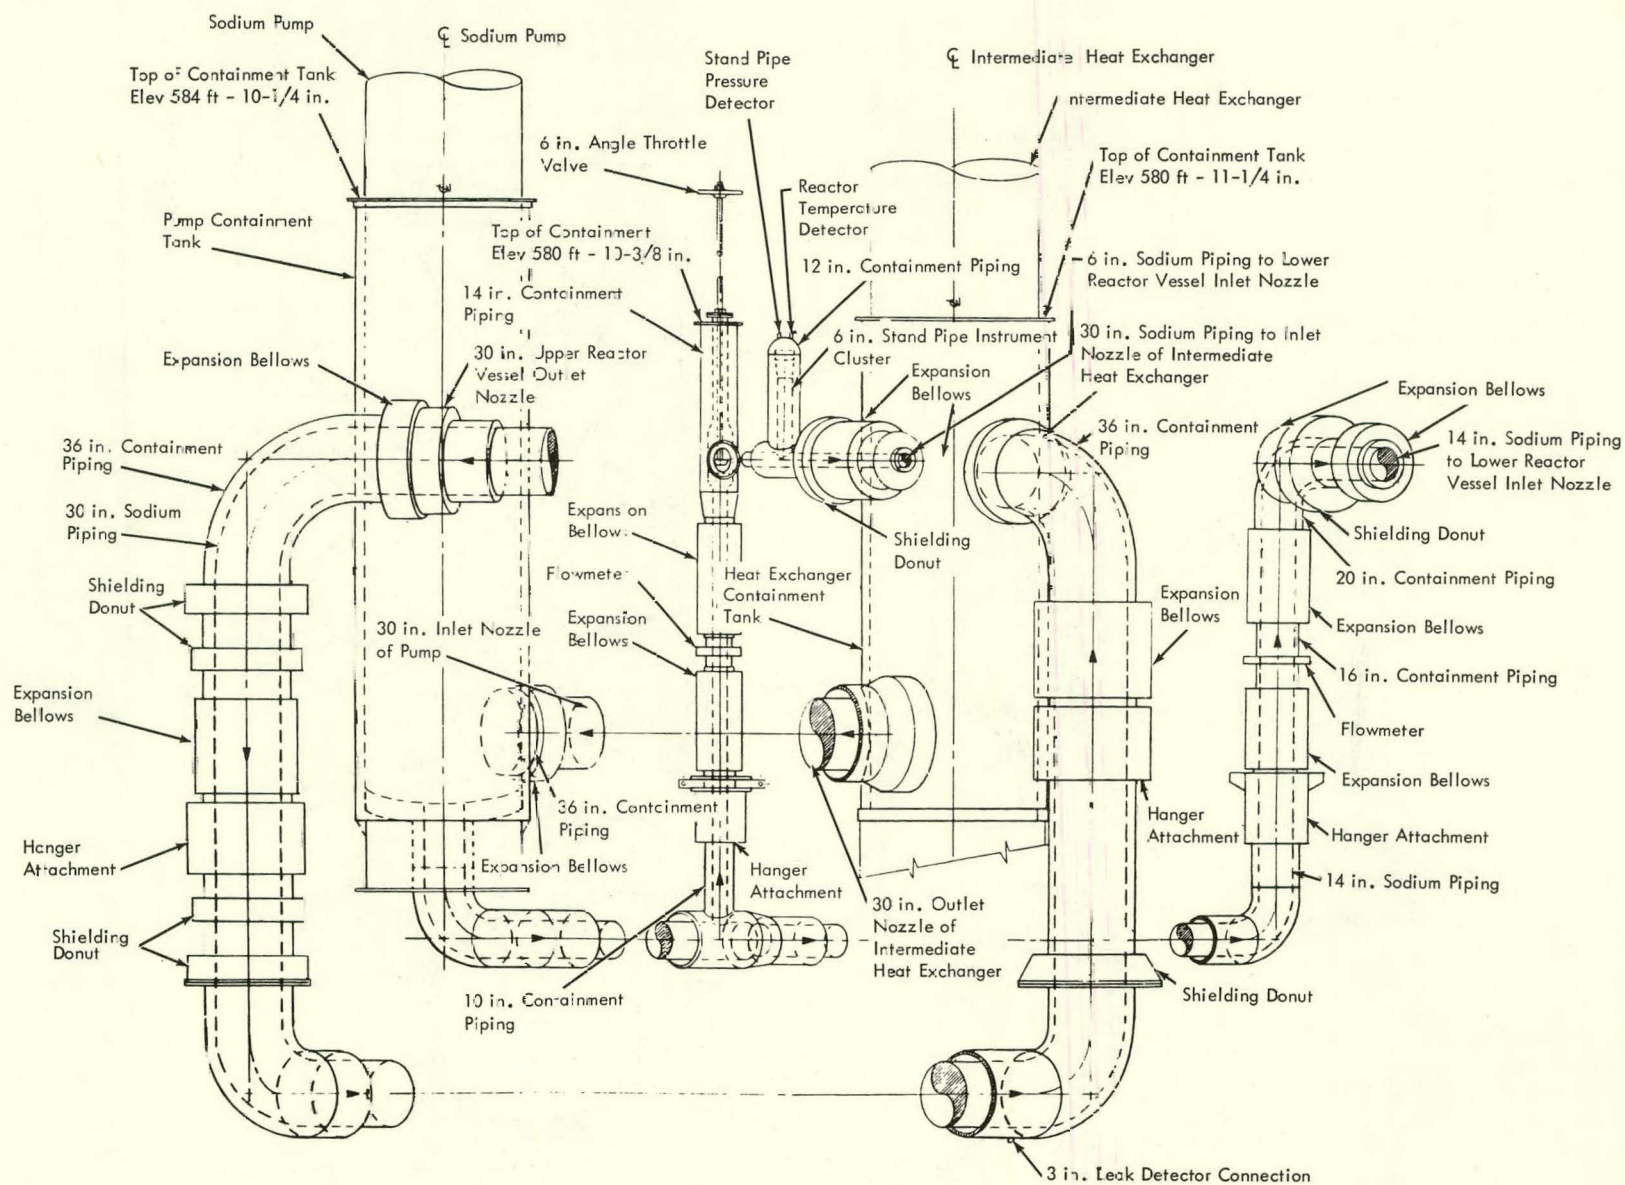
ELEVATION VIEW OF PRIMARY PIPING
